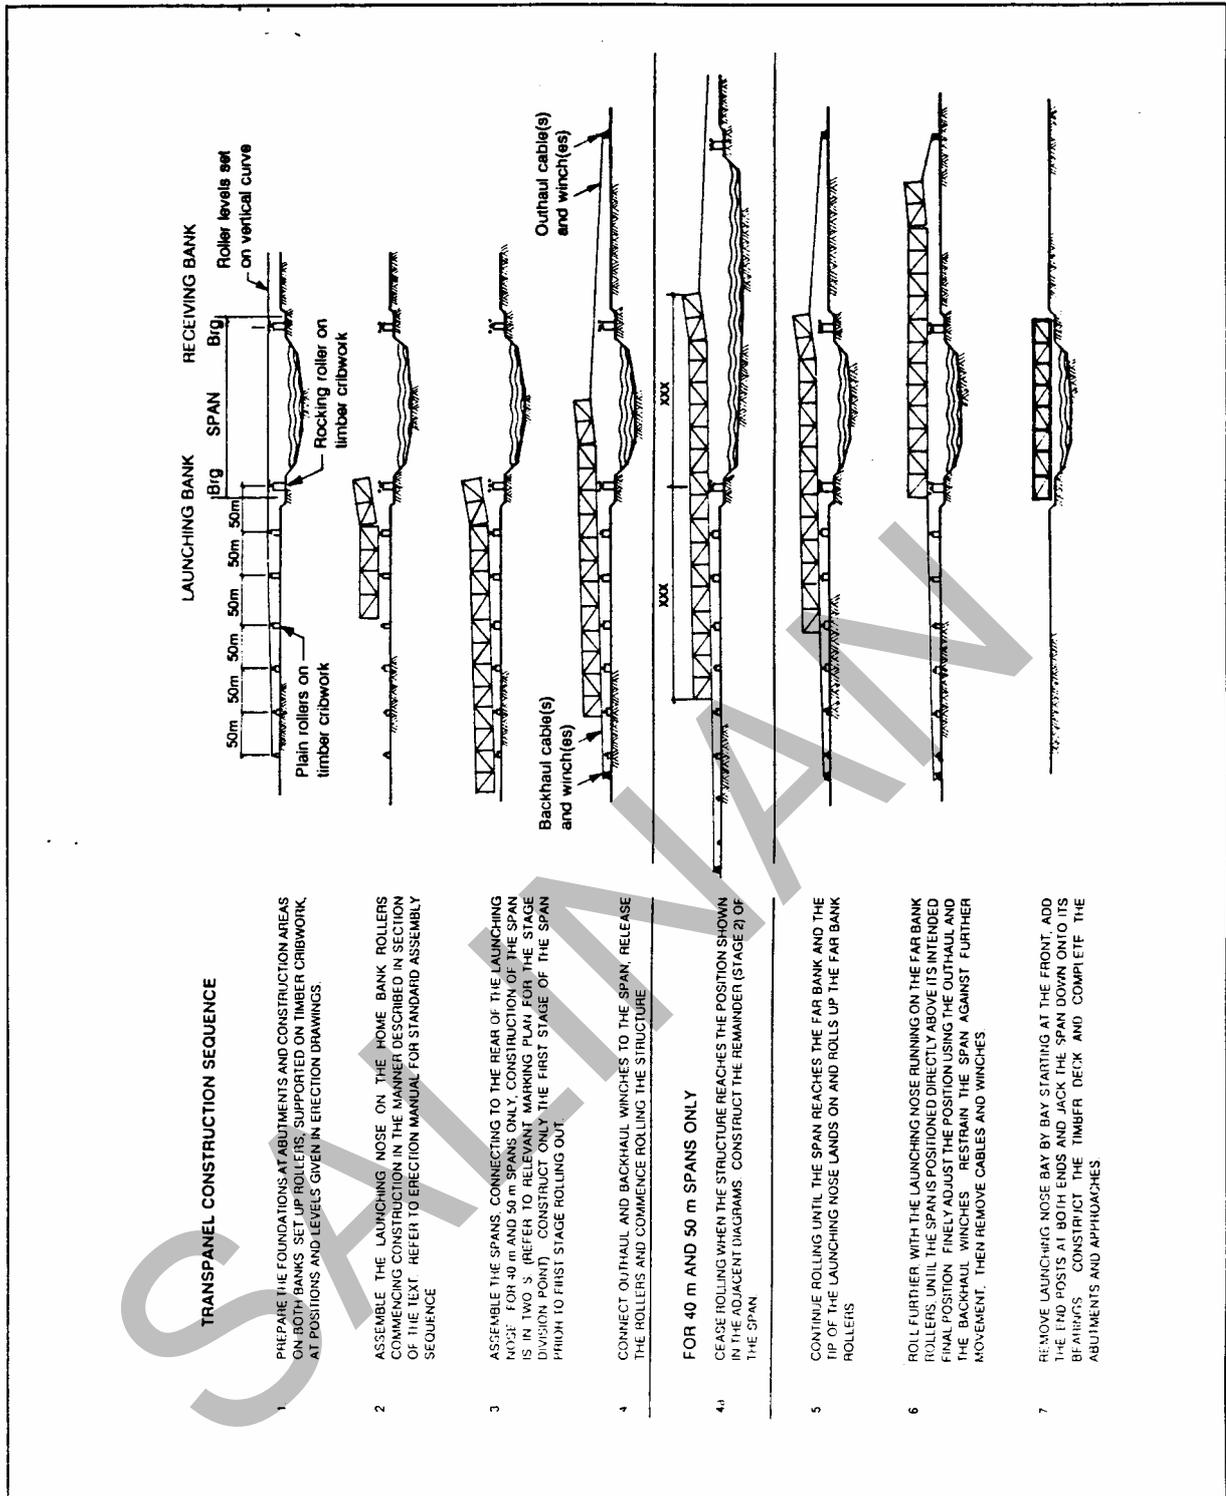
Launching of Transpanel bridge - General Arrangement
